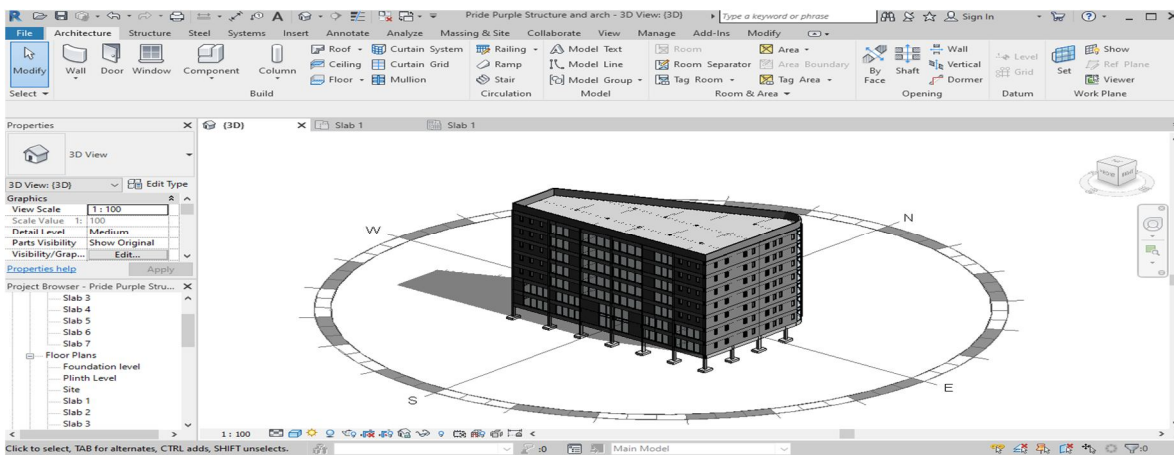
the plan is created in Revit Architecture at level 2, showcasing the column layout in the 3D view.
